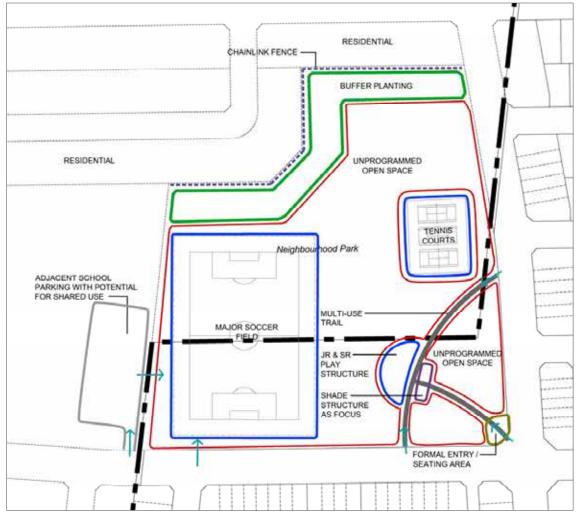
Argo Joshua Creek Conceptual Neighbourhood Park Facility Fit Plan
